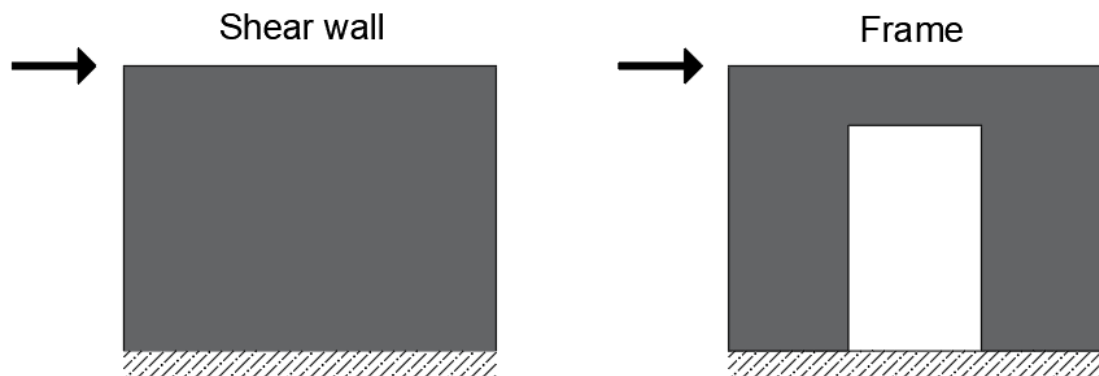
Example of a shear wall with hole can be considered as a frame.
